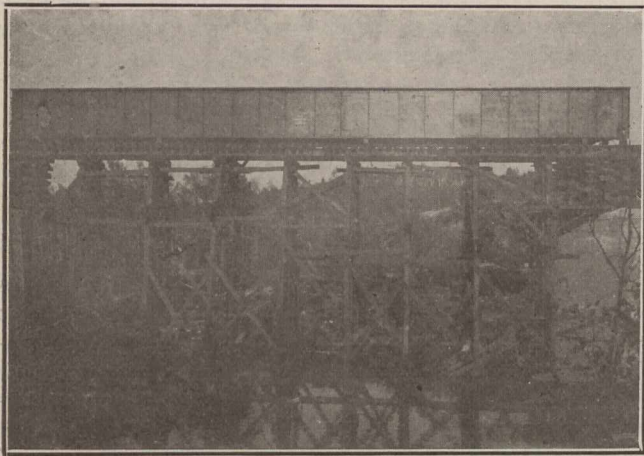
One of the 130-ft. Deck Plate Girder Spans Resting on Blocking on Piers, over Falsework.
